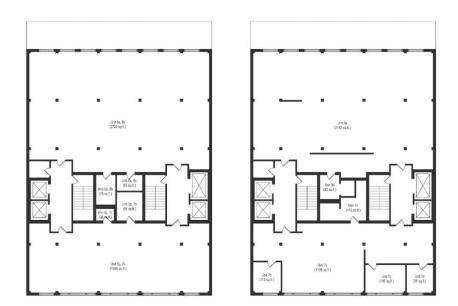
, 513 (left to right): Building 17, third floor (1915); same floor (1984); 1'' = 32'. North is down.
